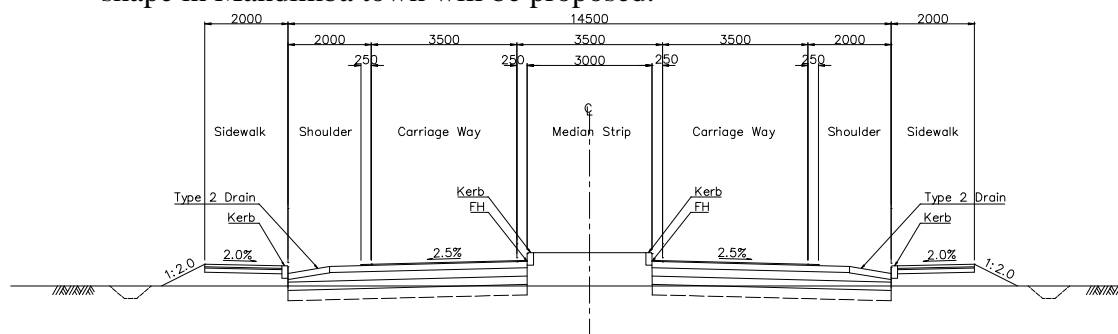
Proposed Typical Cross Section (Mandimba Town)
